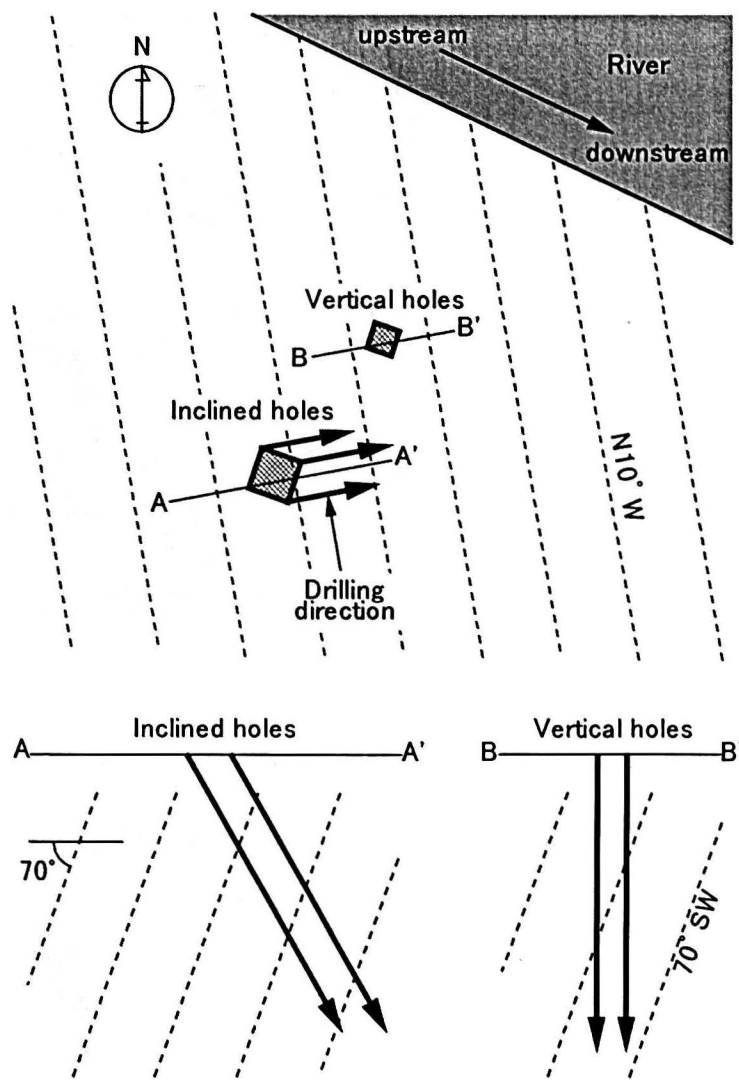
Plan and section of the test site (Dotted lines indicate the predominant direction of joints.)
